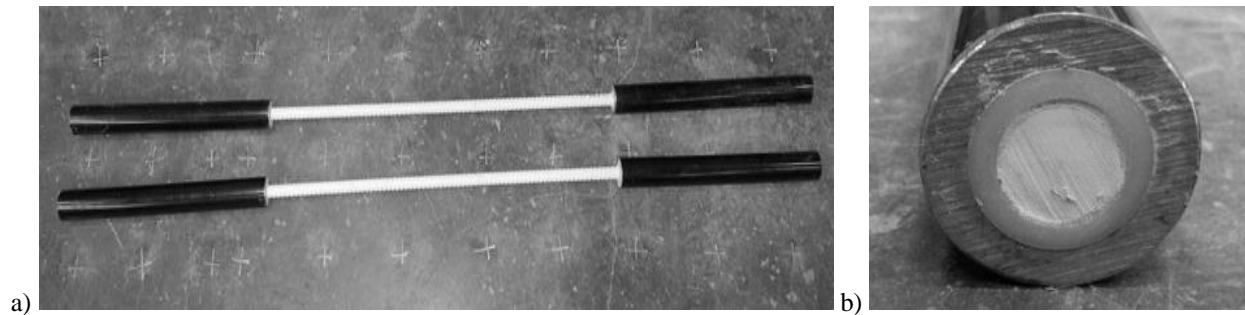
Tensile test specimen M16 bar – length 1400mm a) overall view, b) end view
